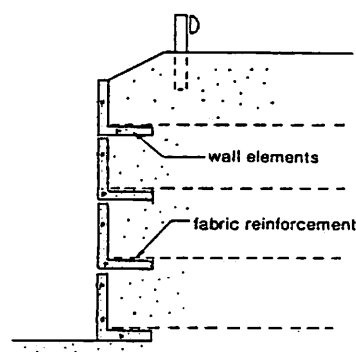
Fabric-reinforced soil retaining wall with a L-shaped block facing (Broms, 1978)
